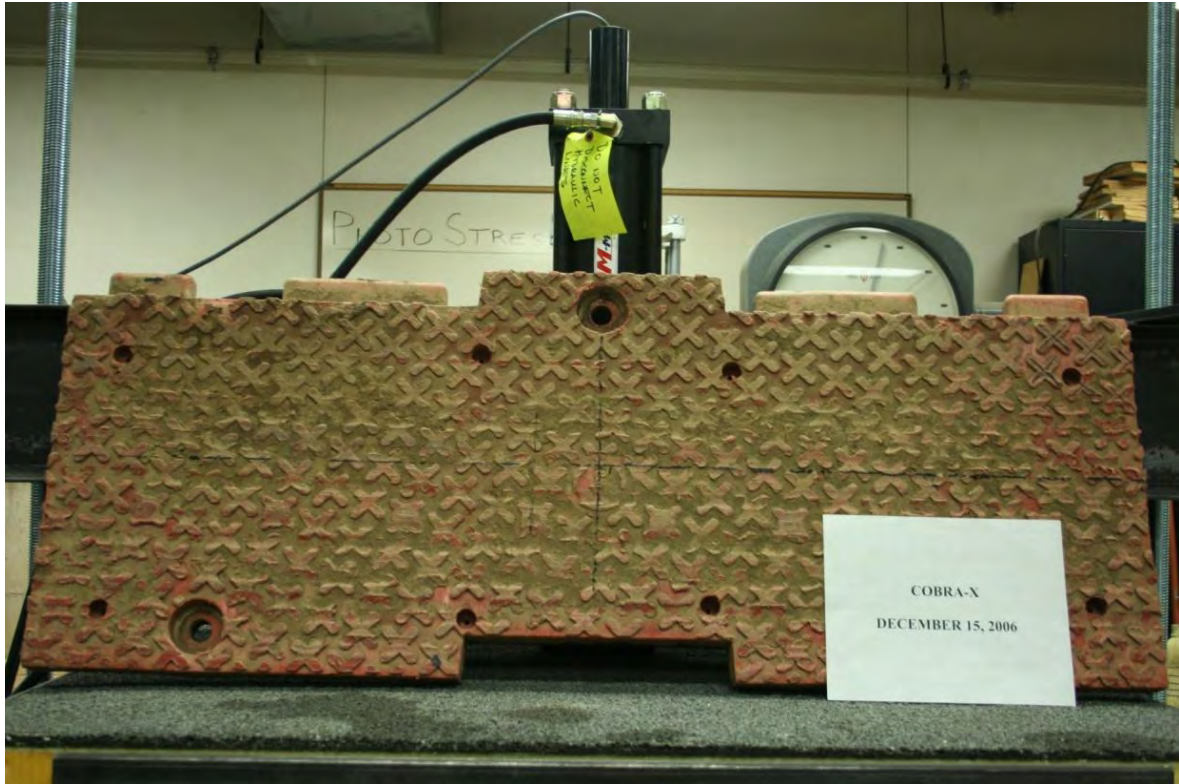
Cobra X top surface, typical bridge-deck panel.
